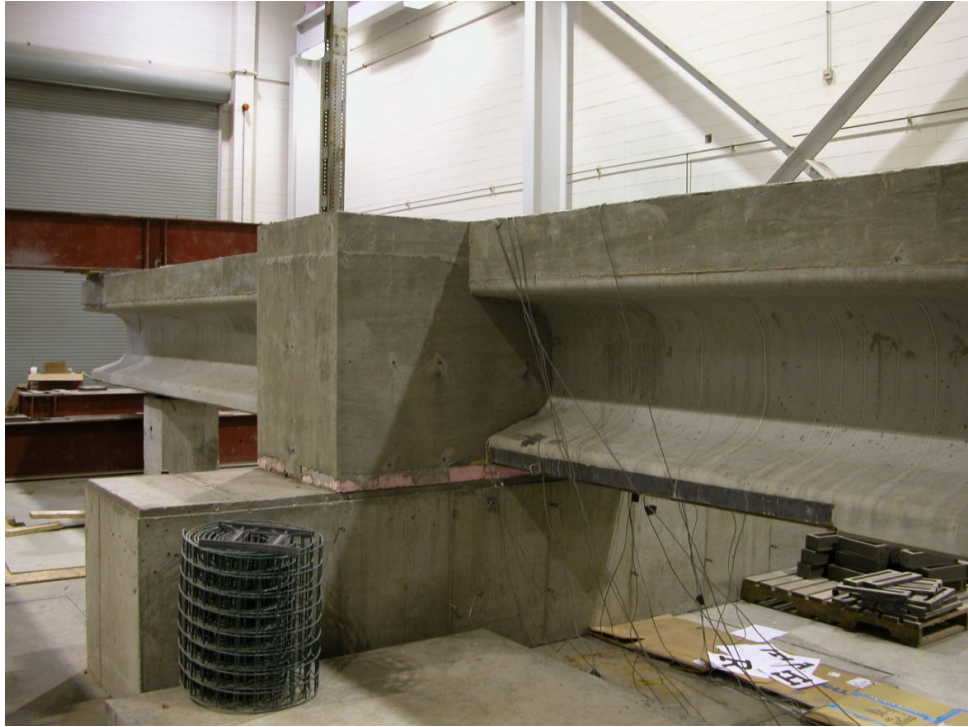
Deck, Girder and Diaphragm after Taking the Forms
